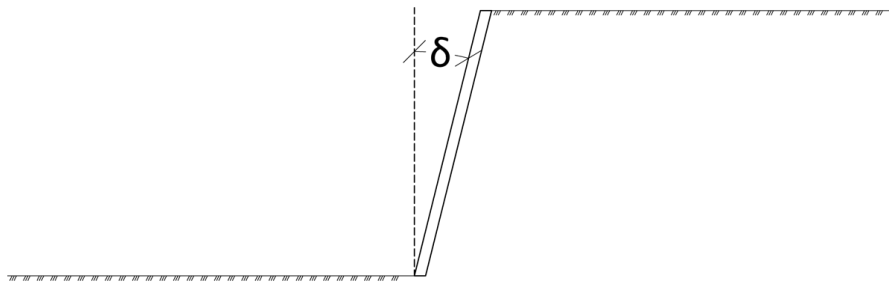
Retaining wall sloped into the backfill and the angle δ .
